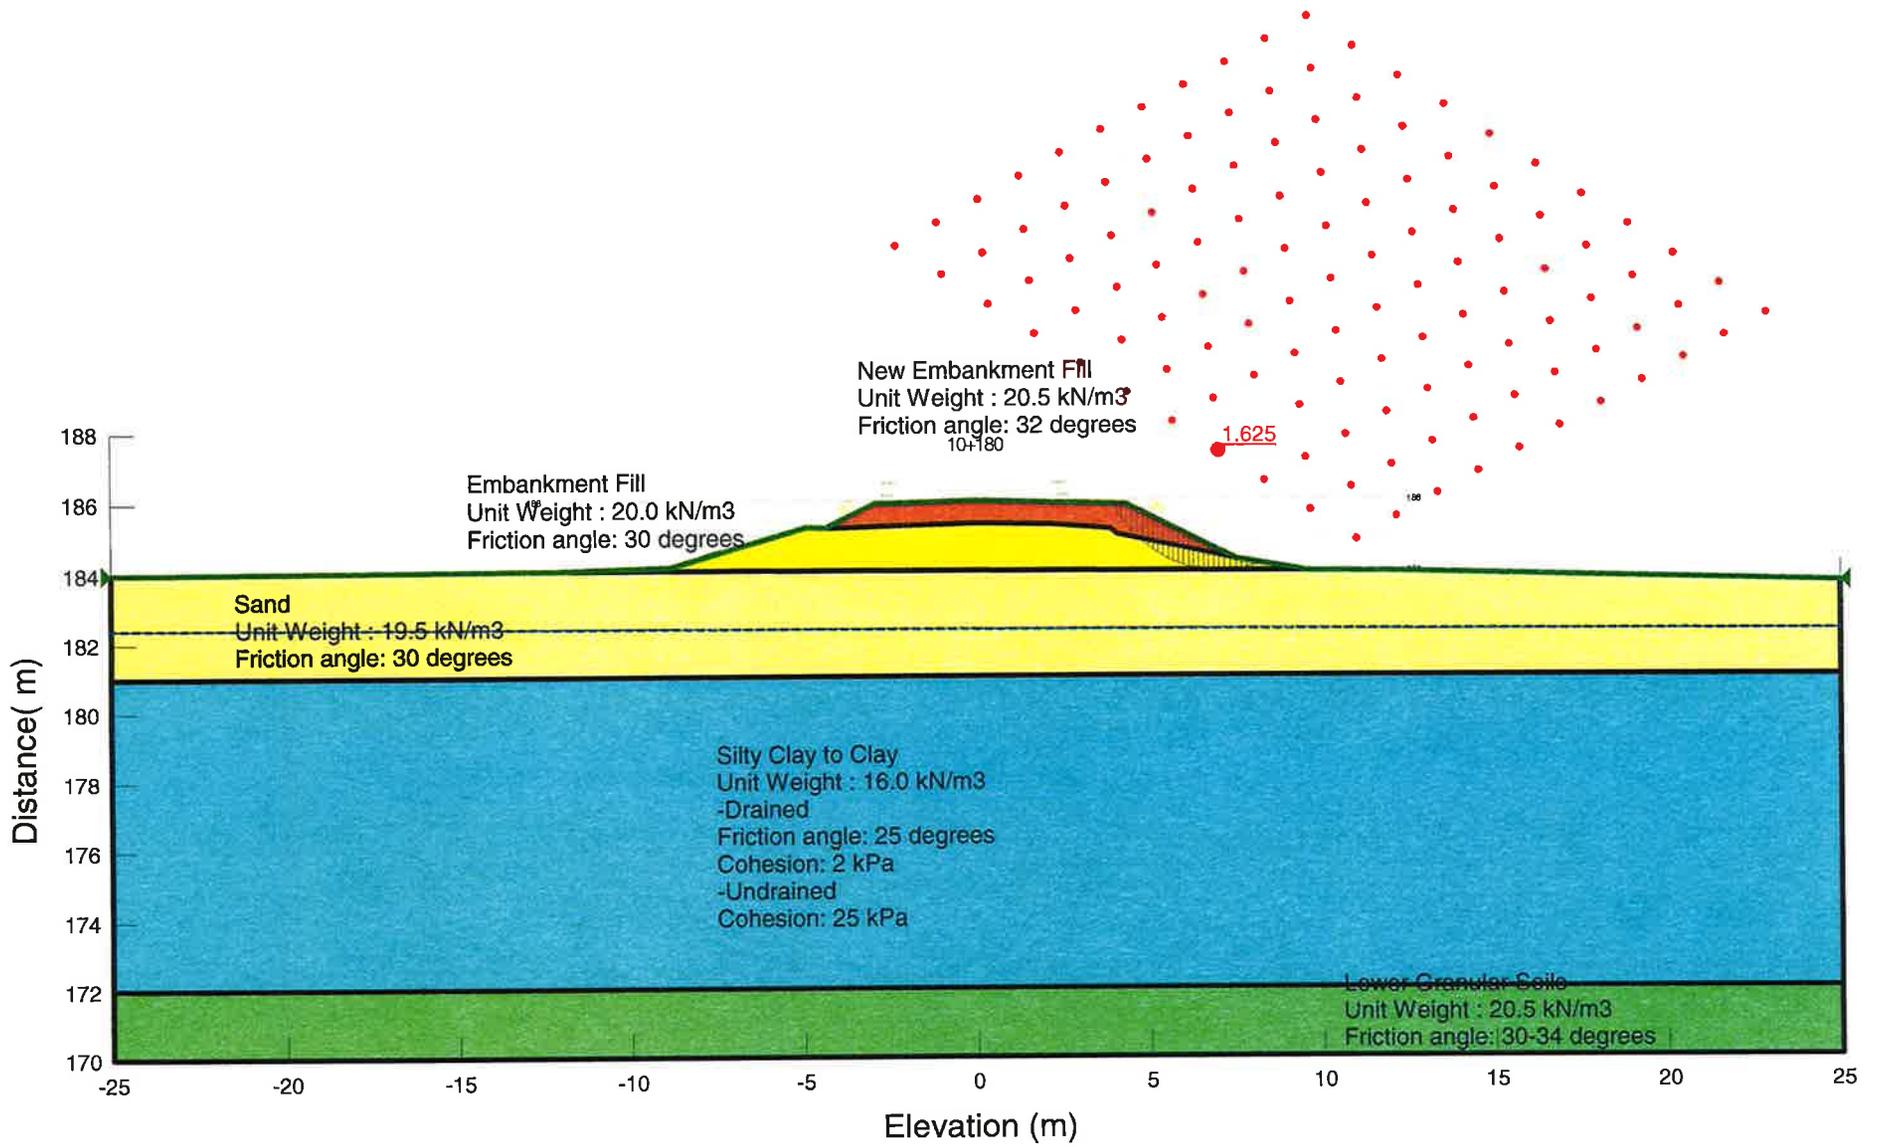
Stability analysis @ STA 10+180 (north abutment location) for prefabricated bridge option
